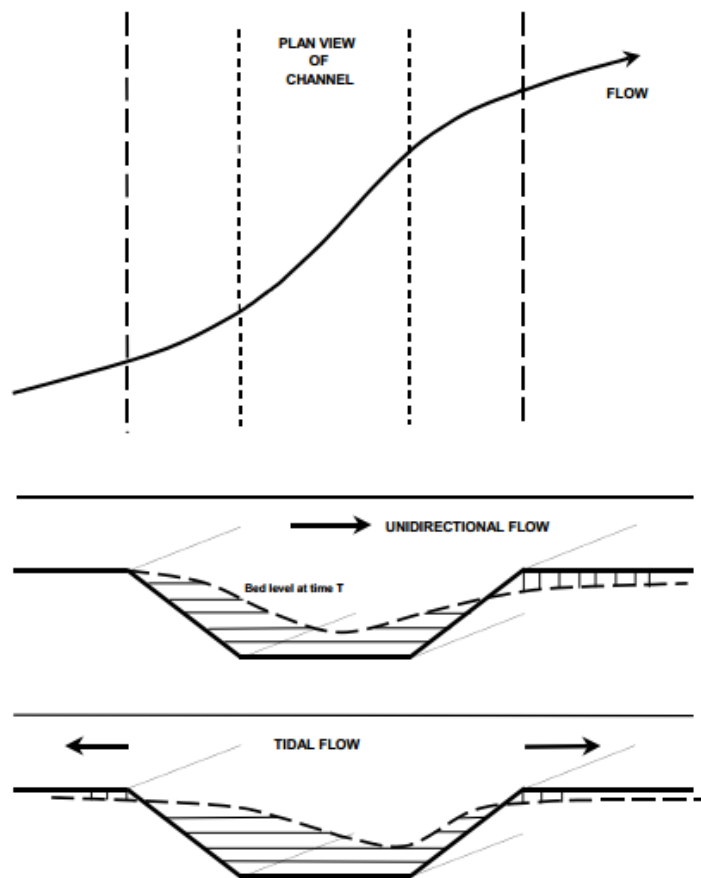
Channel Sedimentation (plan view and cross-section)
